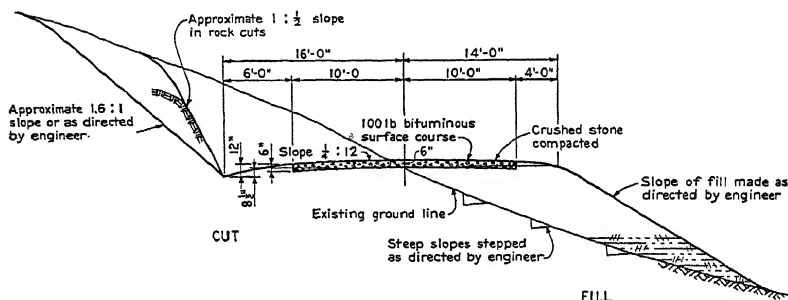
Typical cross section of access road, Norris Dam-Halls Crossroads.
